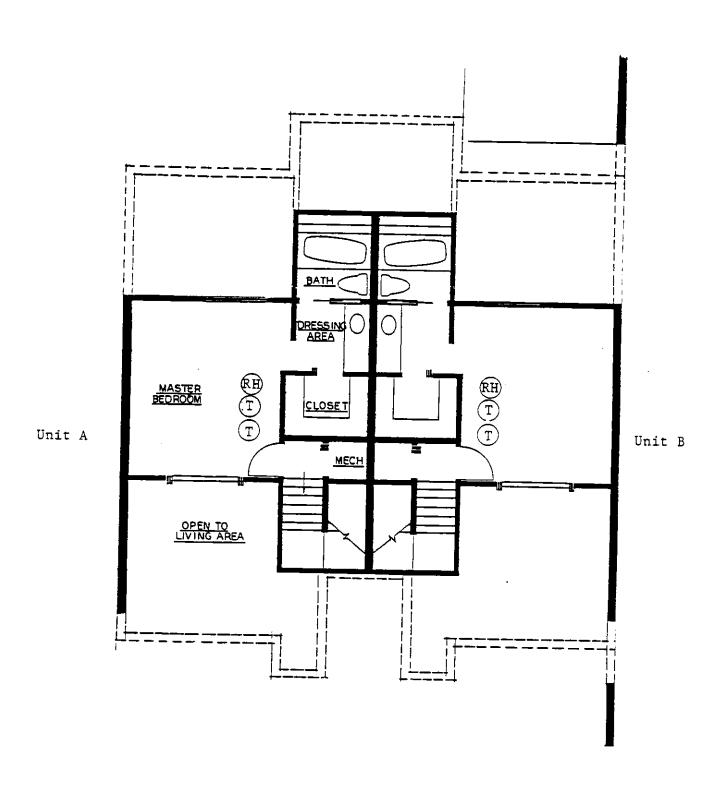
Second Floor Plan of Units A and B Showing the Location of Temperature Sensors (T) and Relative Humidity Probes (RH)
